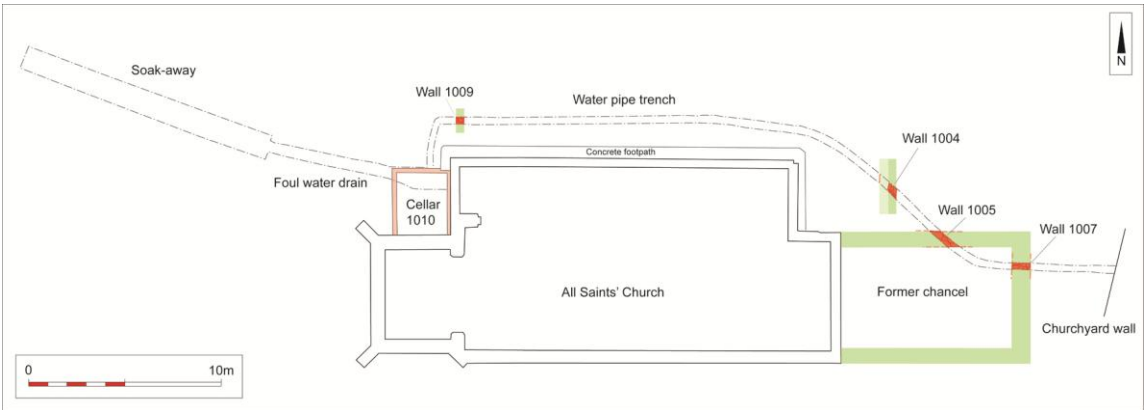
Site plan, derived from architect's drawing, showing location of walls in red and putative wall lines in green
